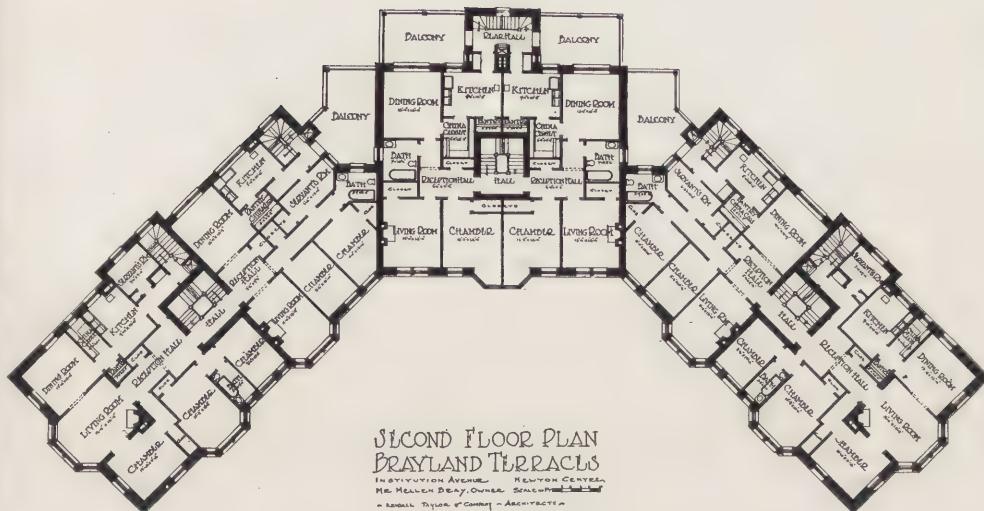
TYPICAL FLOOR PLAN—BRAYLAND TERRACES, NEWTON CENTER, MASS.
